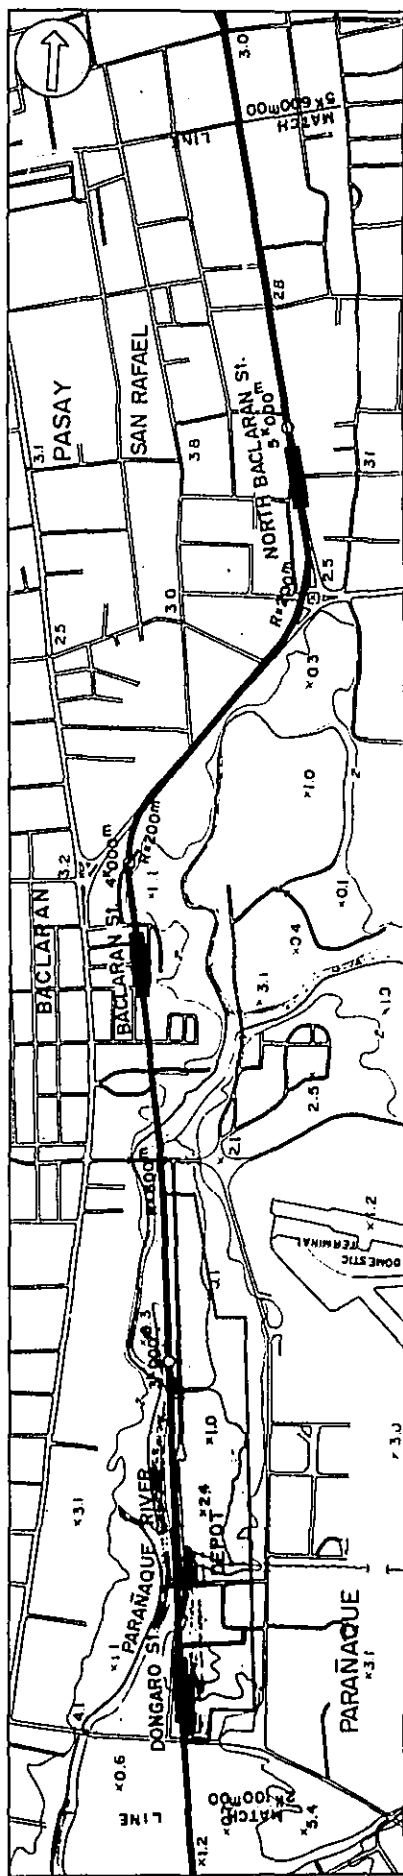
Plan and Profile for Elevation of Taft Avenue (1)
